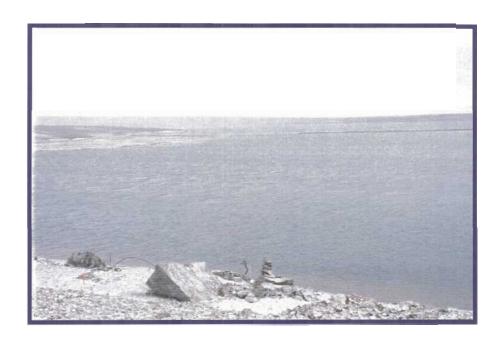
View of Garrow Lake and west end of wave break structure, looking upstream from top of dam.
